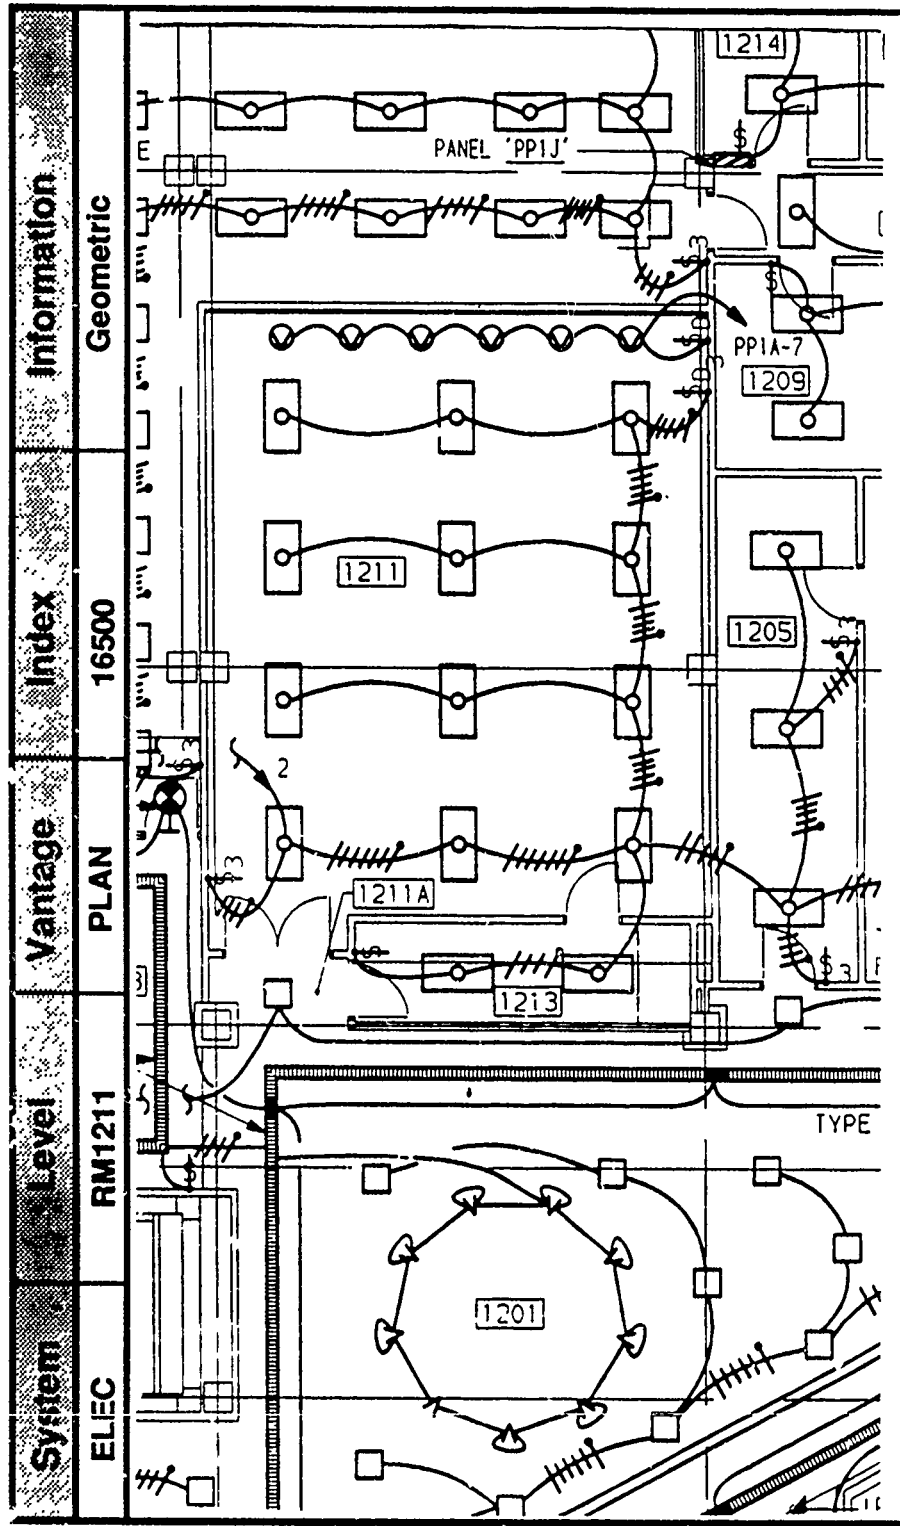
Example of Frame for Case 4: Room 1211 Lighting Plan
